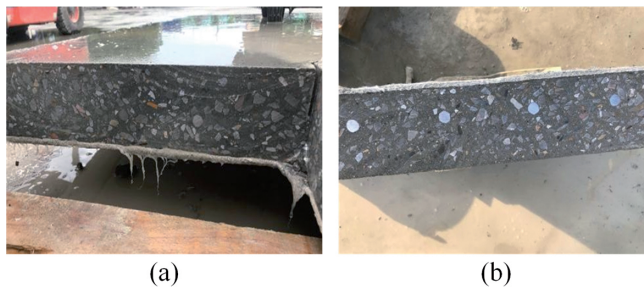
Photographs of cross-section of filing layer; (a) Mix No. 0.484-0.195-13.6; (b) Mix No. 0.616-0.19-12.4
